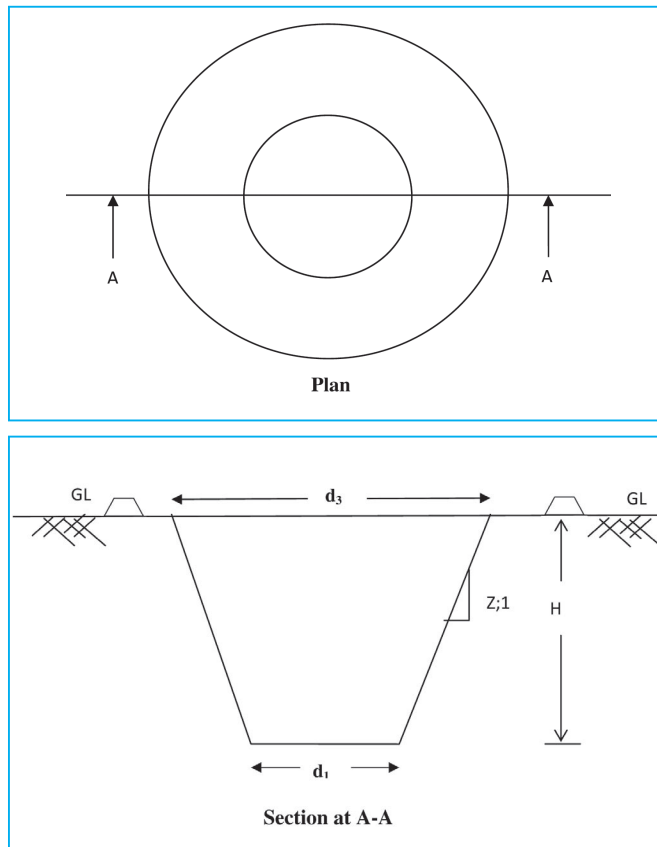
(b) : Plan and section view of inverted cone dugout farm pond
